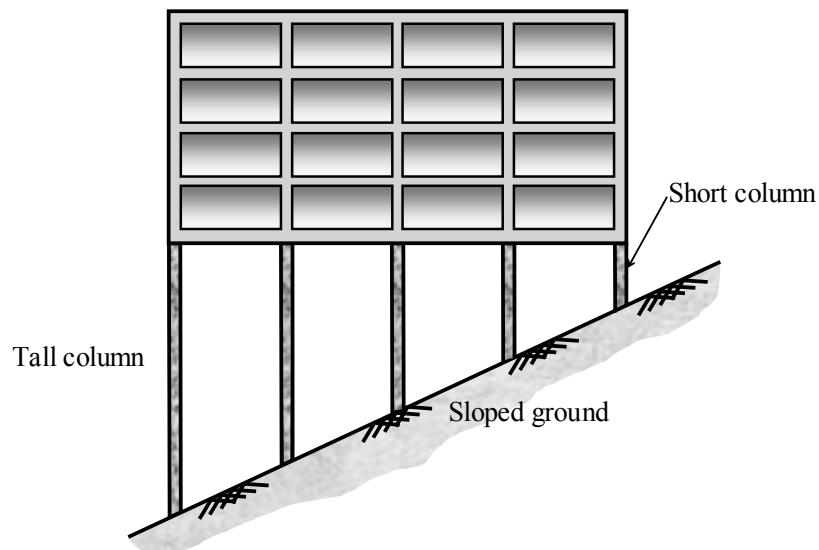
“Short column” effect due to sloping site (Ref. 0.16)
